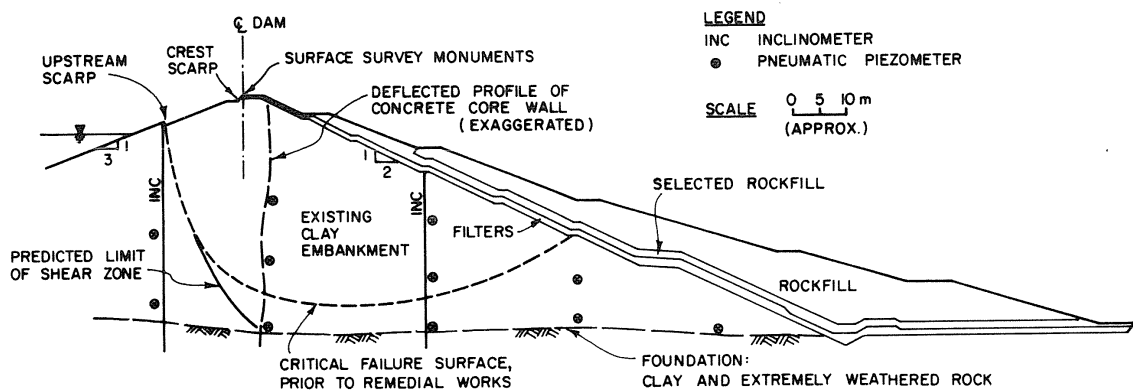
Typical Section with Stabilizing Rockfill (simplified), (After Barnes et al, 1984).
